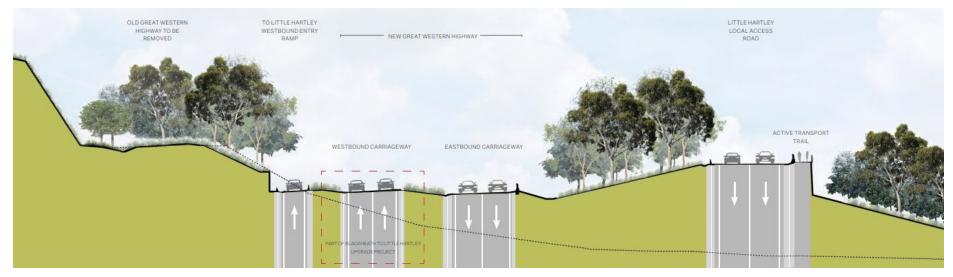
Typical cross section of carriageway of the new Great Western Highway (as modified)
